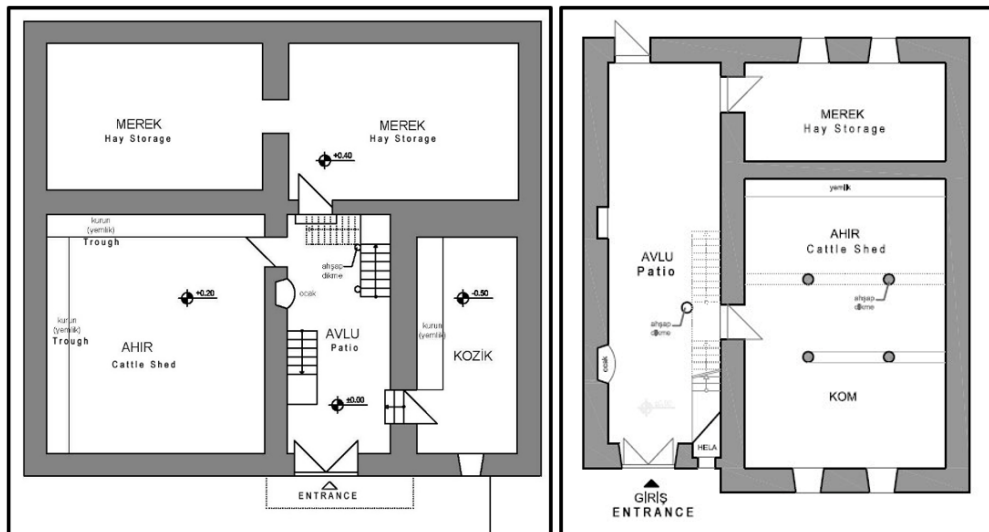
Varied Plan Types According to the Location of the Courtyard in Arapgir Village Houses.
